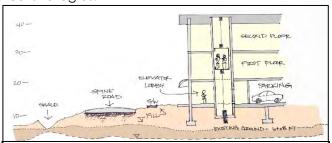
Section graphic showing the approximate -elevation constraints and the relationship of proposed fill dirtto the proposed building improvements.
